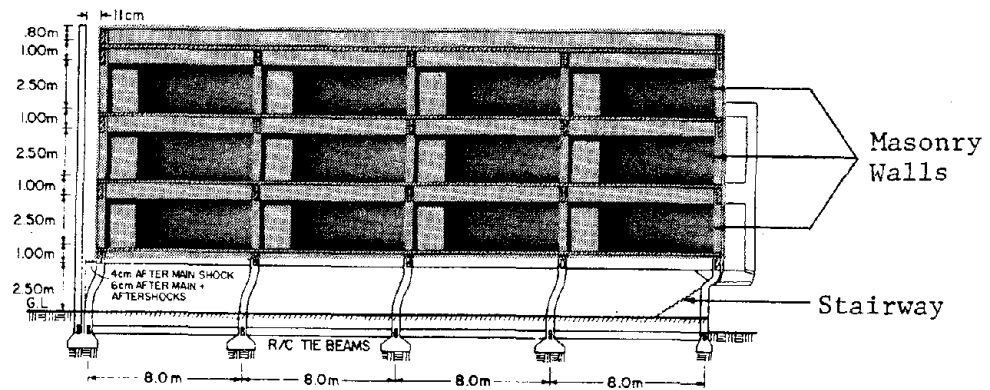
LONGITUDINAL ELEVATION OF THE ENET NO. 2 BUILDING ILLUSTRATING PERMANENT DISPLACEMENT AFTER EARTHQUAKE
